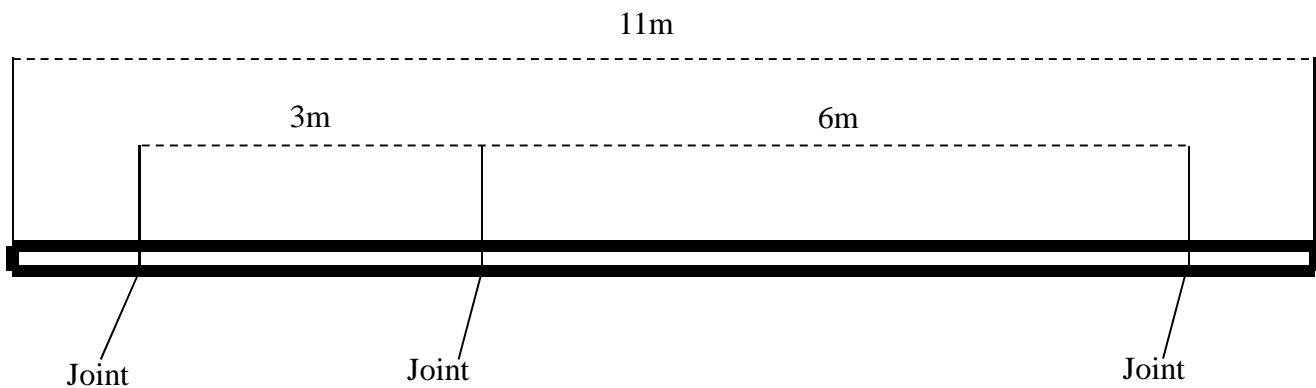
Concrete strip with 6 m and 3 m spacing between saw cut joints
